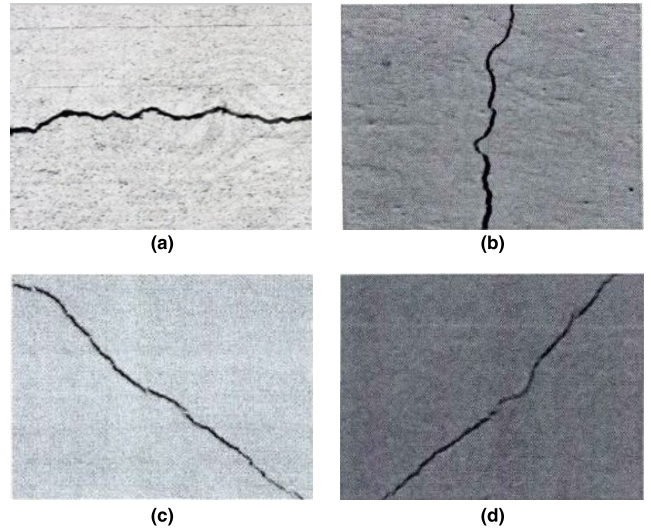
Classification of crack images. (a) Transverse crack. (b) Vertical crack. (c) Inclined crack. (d) Inclined crack.
